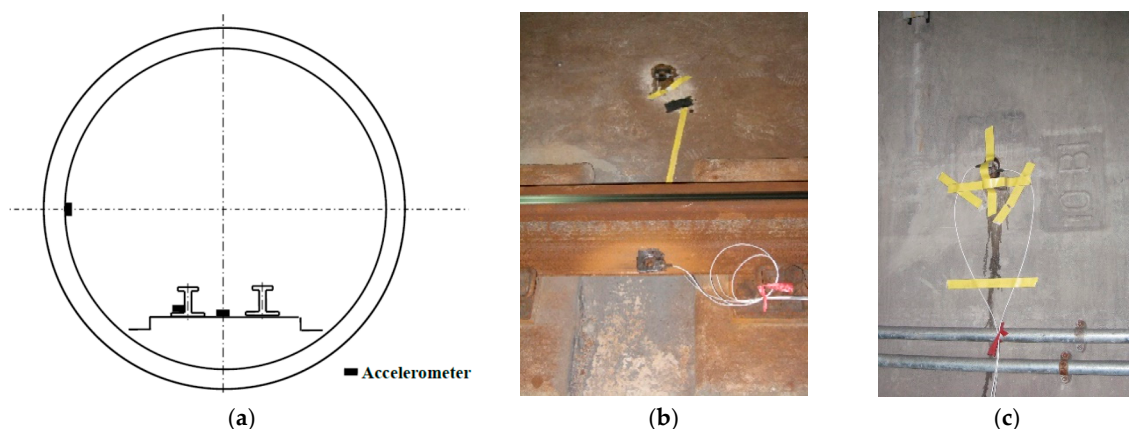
Location of the accelerometers in the tunnel. (a) Accelerometers setup in the tunnel, (b) Accelerometers on the track and ballast bed, (c) Accelerometers on the tunnel inner wall.
